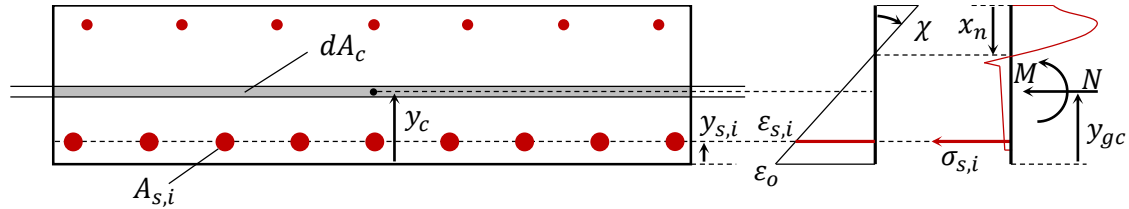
Distribution of strains and stresses of a concrete cross-section with fibres and steel rebars.
